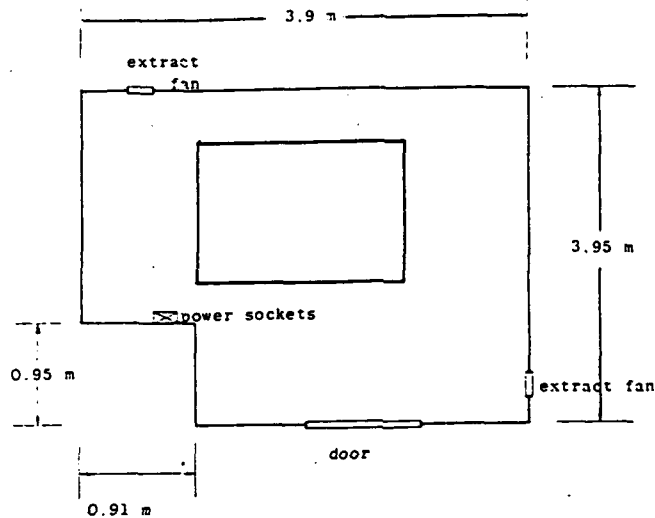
Floor plan of the Faculty of Technology anechoic chamber.
